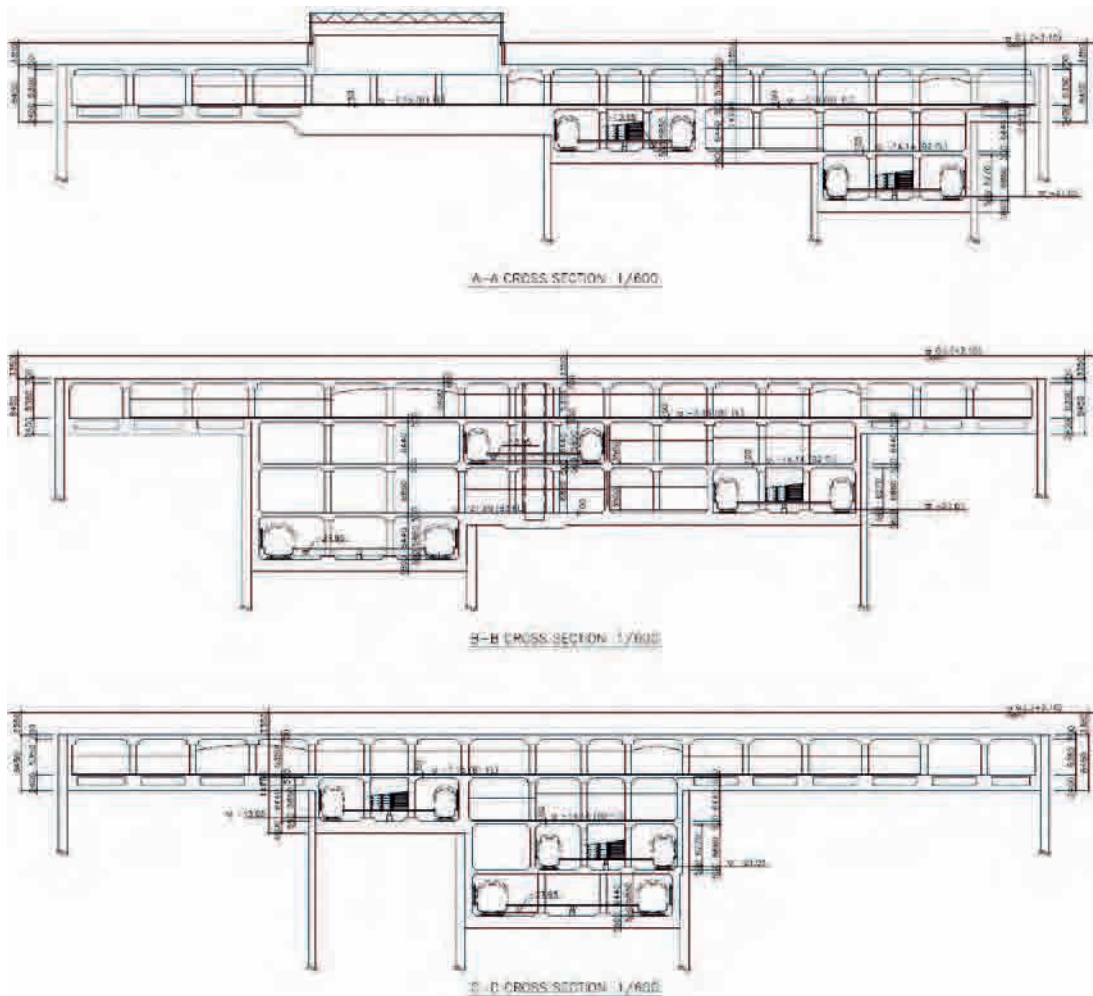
Typical Cross Section, Ben Thanh Central Station
